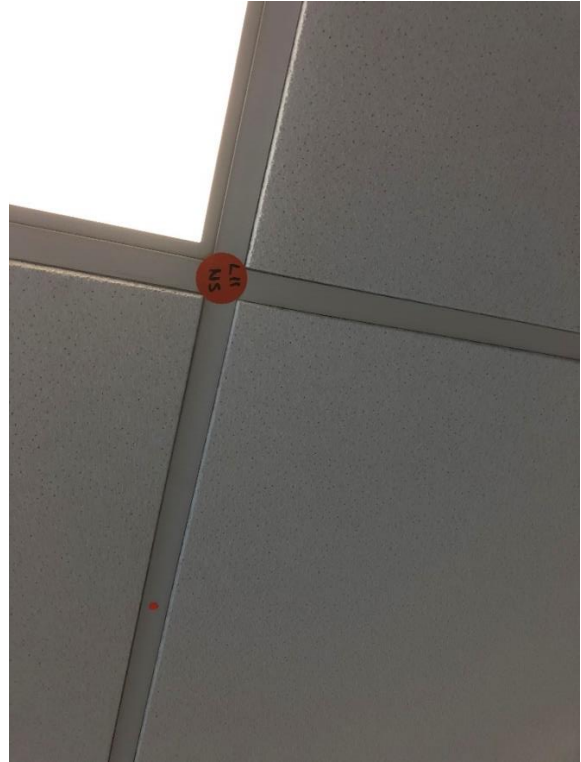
Adhesive label identifying the inspective location (L11 NS)
